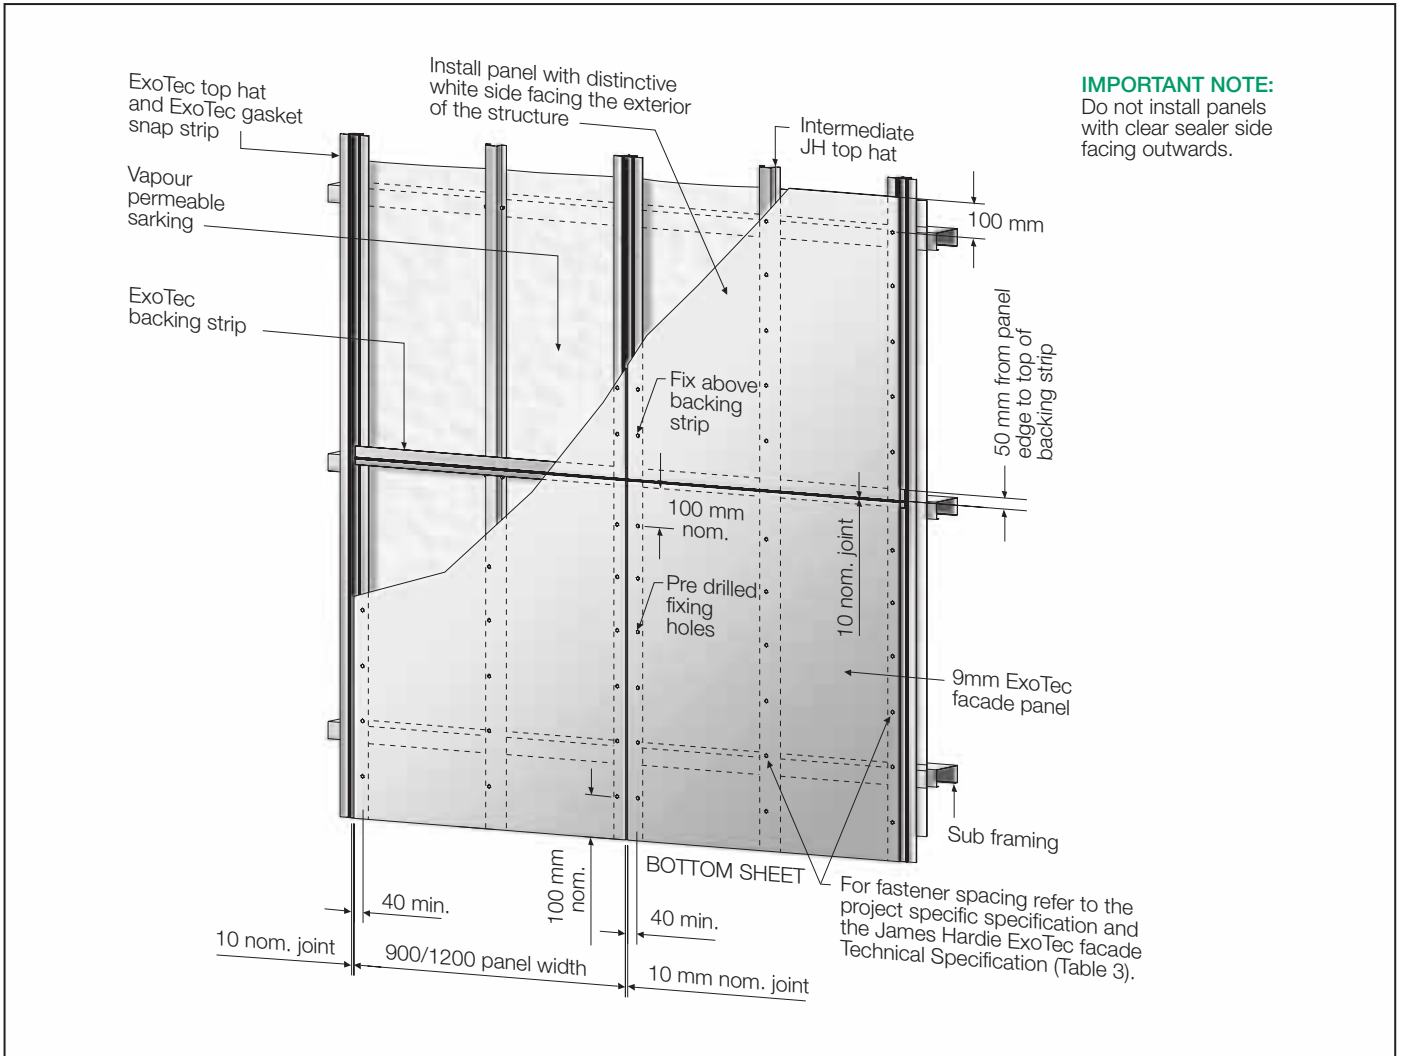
TYPICAL PANEL AND FRAMING LAYOUT
